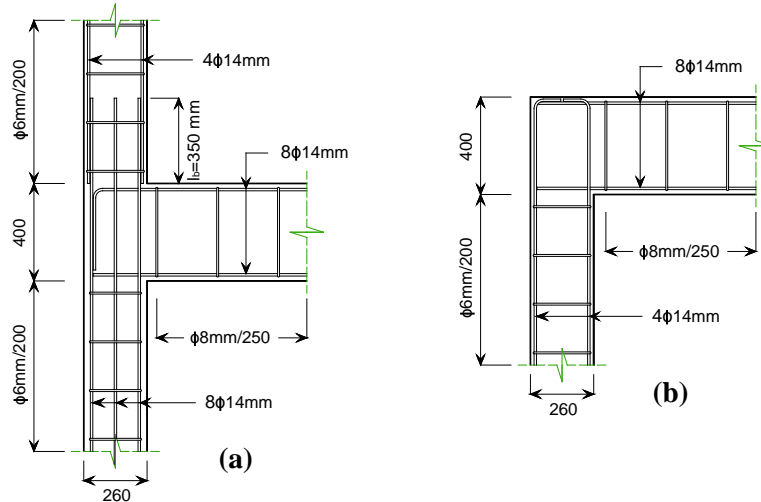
Detailing of columns and beam-column joints at (a) 1st floor, and (b) 2nd floor, X direction
